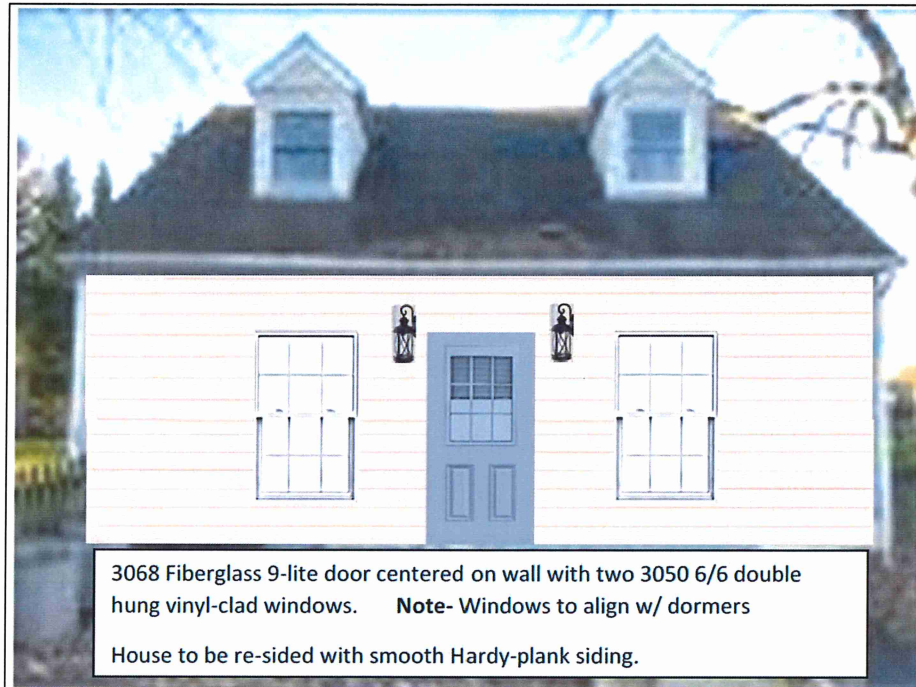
Garage structure located at the rear of the house, facing Opossumtown Pike.
